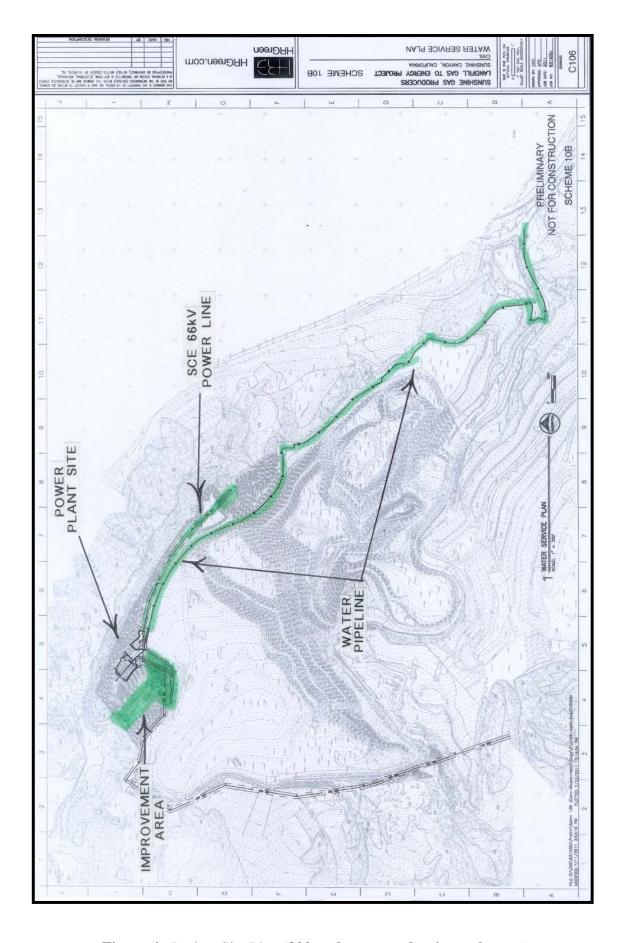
Project Site Plan (300 scale map, reduction unknown).
